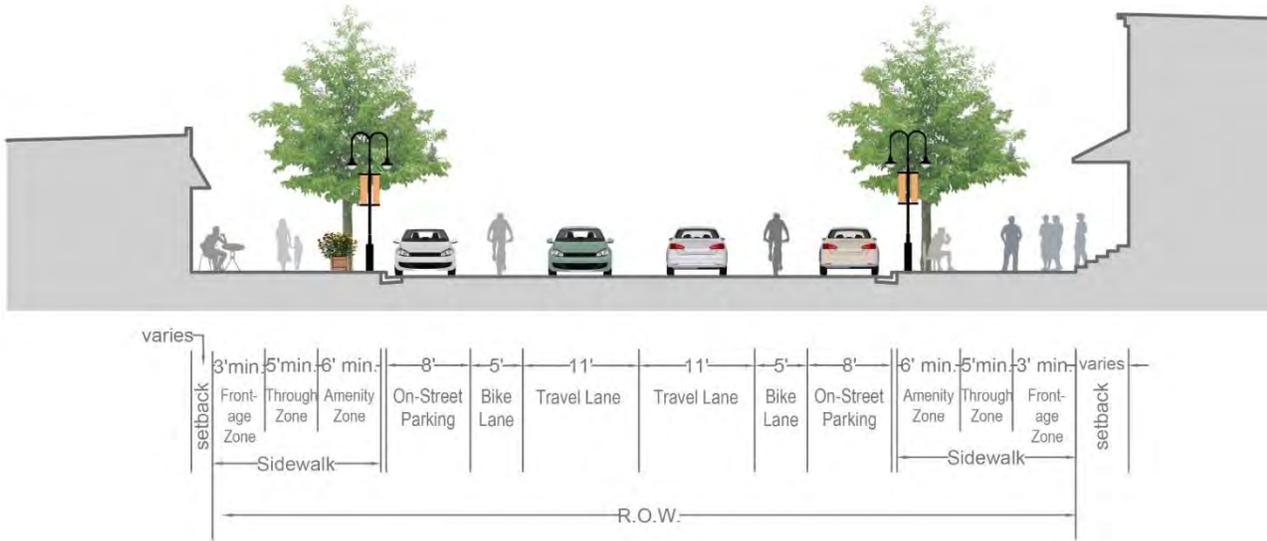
Cross Section Concepts for Streets in the Mixed Use Residential District
